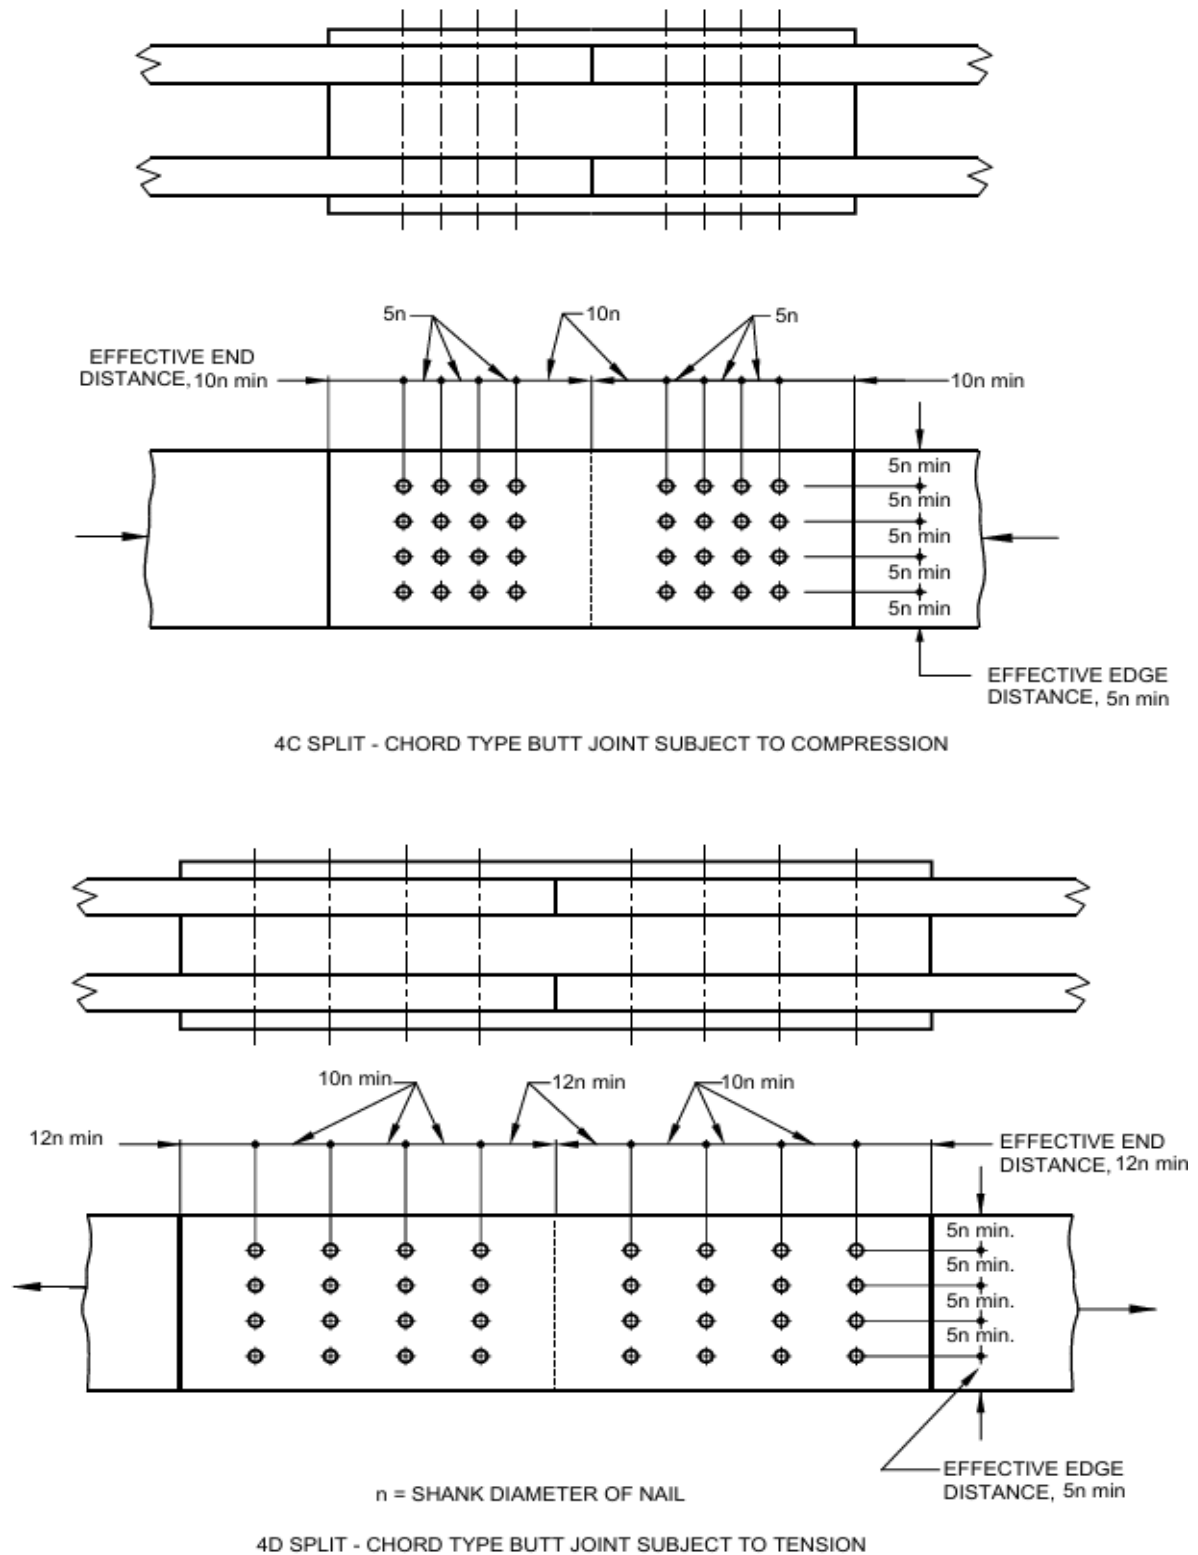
SPACING OF NAILS IN A LENGTHENING JOINT
